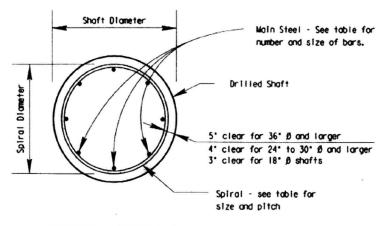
Details of drilled shafts for secant wall and sound wall foundation.
